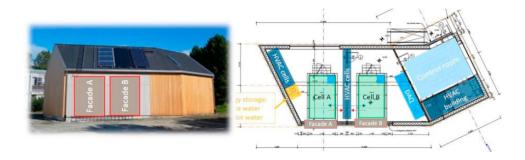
Left: External surface from south. Right: Floor plan of the building, Ref.: (Goia et al. 2017).
